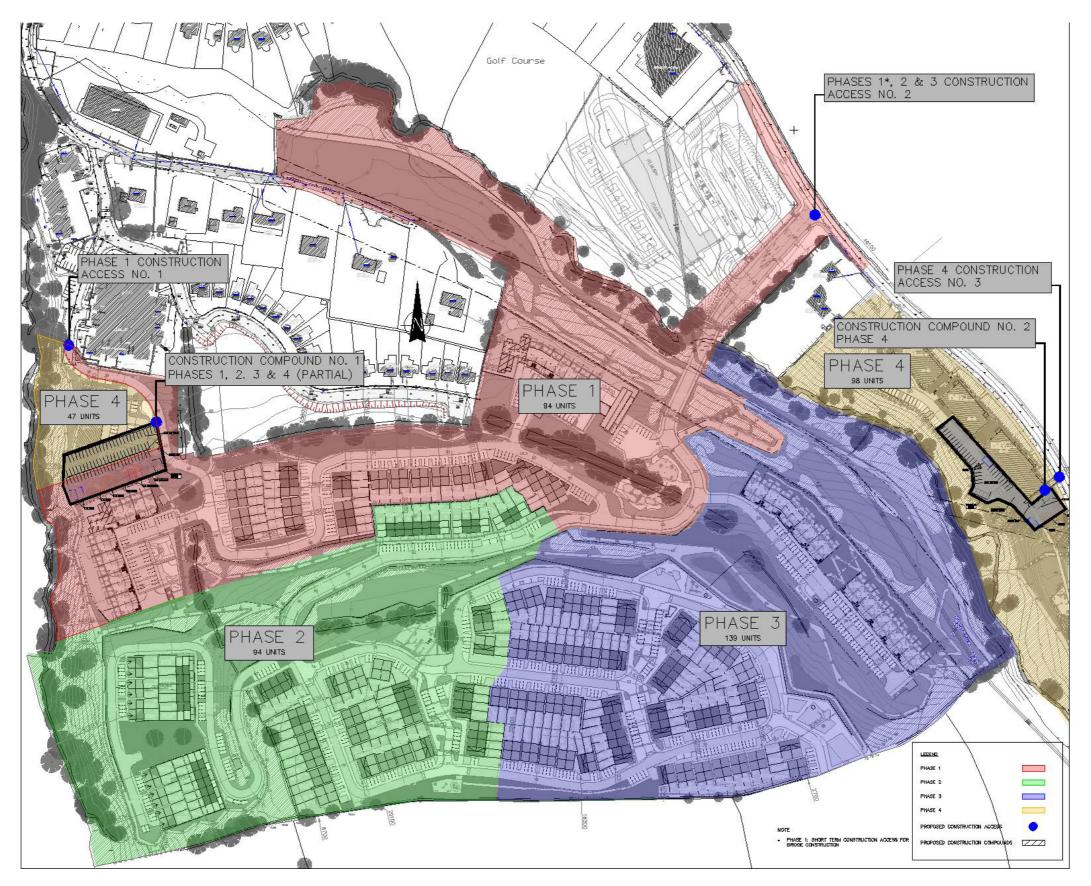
Phasing Plan, Construction Access and Construction Compounds
